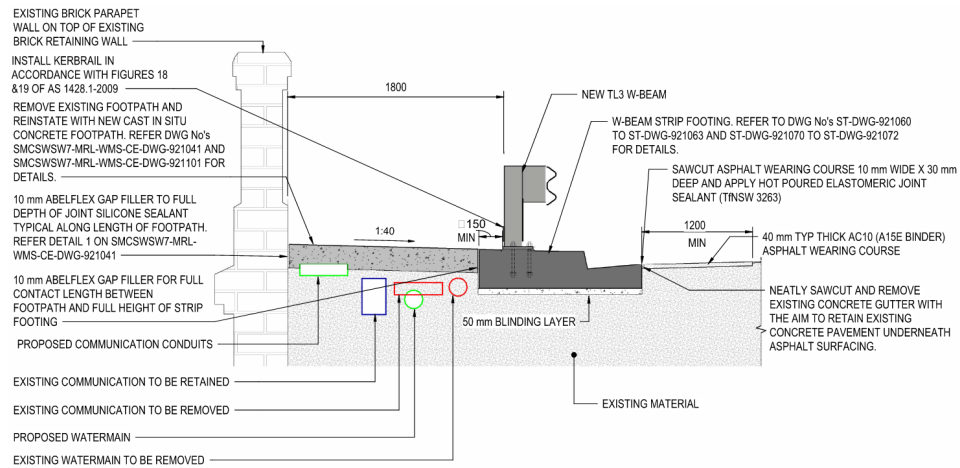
Cross section of the proposed countryside footpath behind TL3 w-beam
